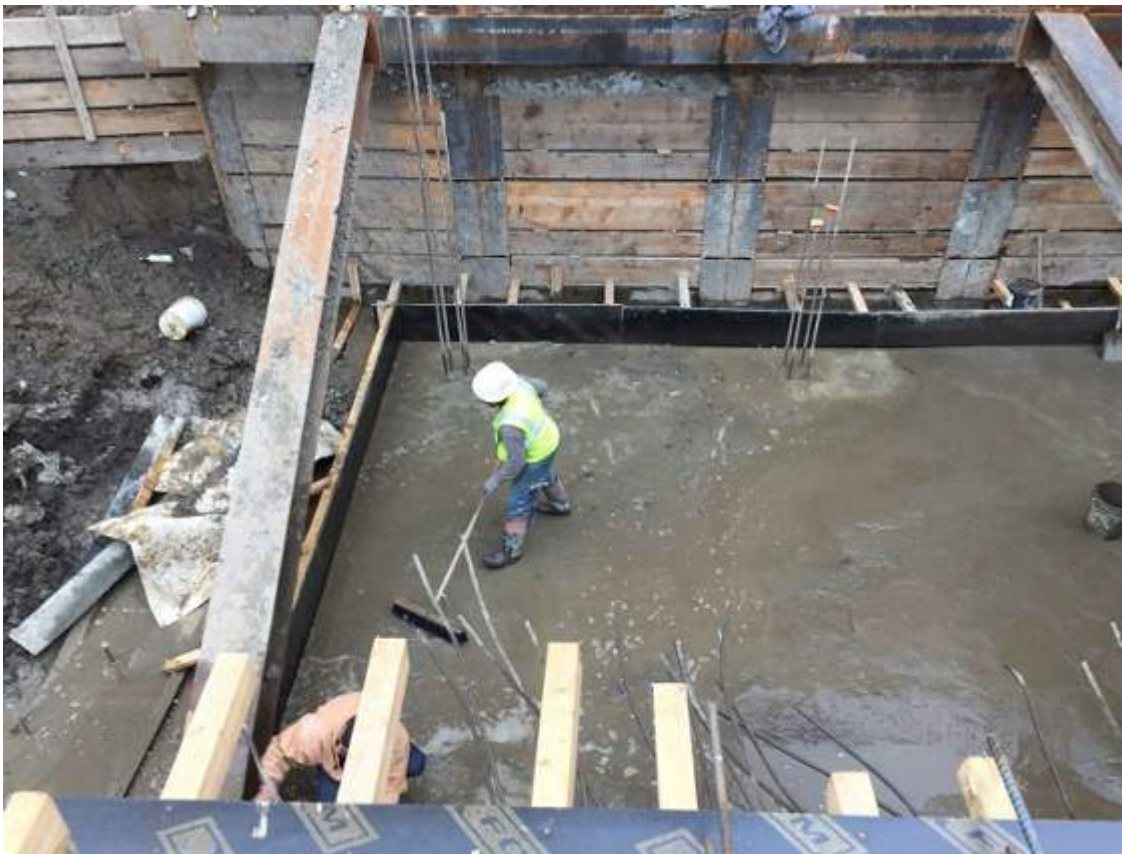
View of the contractor preparing the south wall for lagging installation, facing west.
